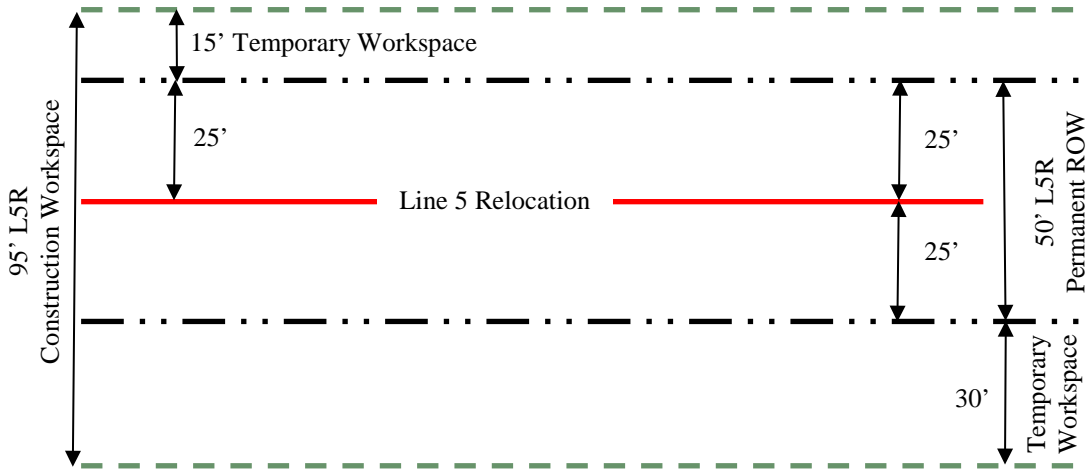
Typical Construction Workspace—Wetlands
